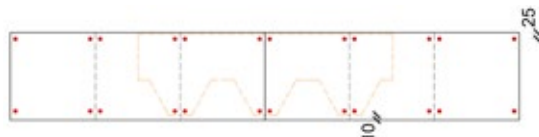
The layout of the installation of starter/ridge shingles on the eave.
